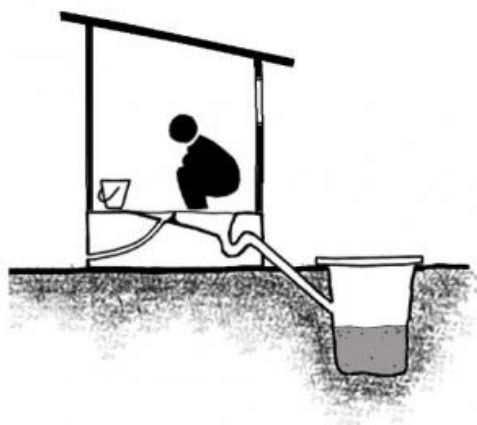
simple design of a urine diverting pour flush latrine. The system in Darechawk has in addition masonry brick walls with concrete lining.
